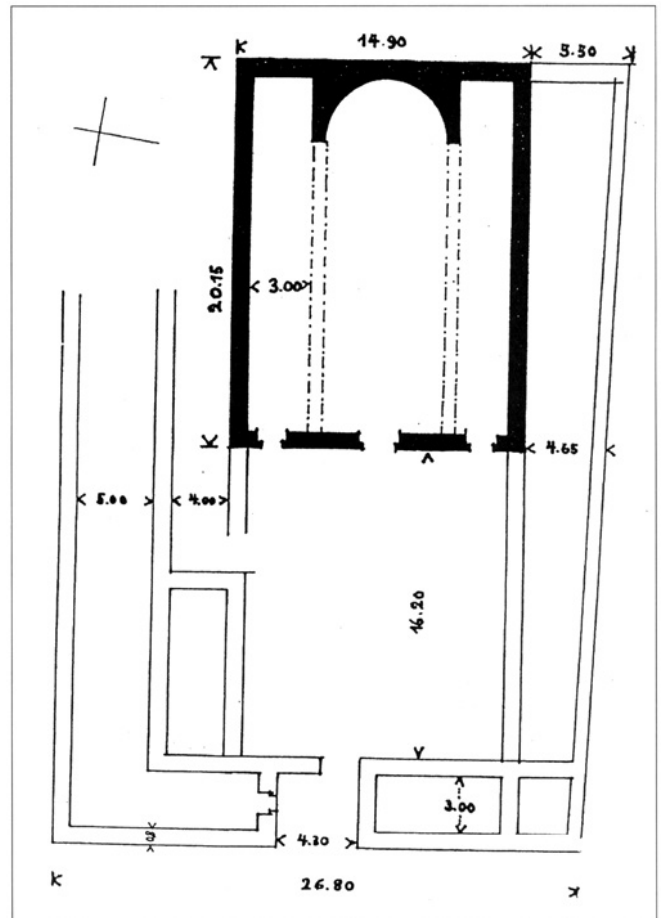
Plan of the church at Khirbet el-Maqatir according to Schneider.
